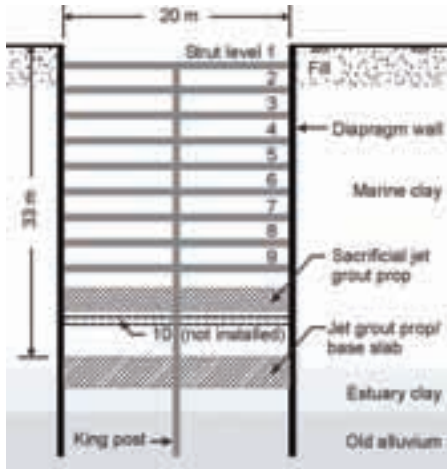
Typical cross section of MRT excavation near Nicoll highway in Singapore which collapsed (based on New Civil Eng., 2004)
